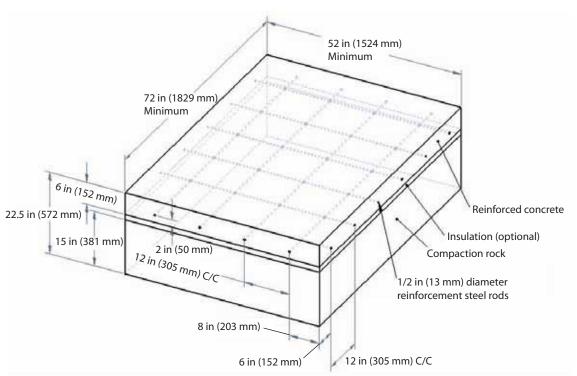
illustrates the concrete slab detail for a typical outdoor application.
